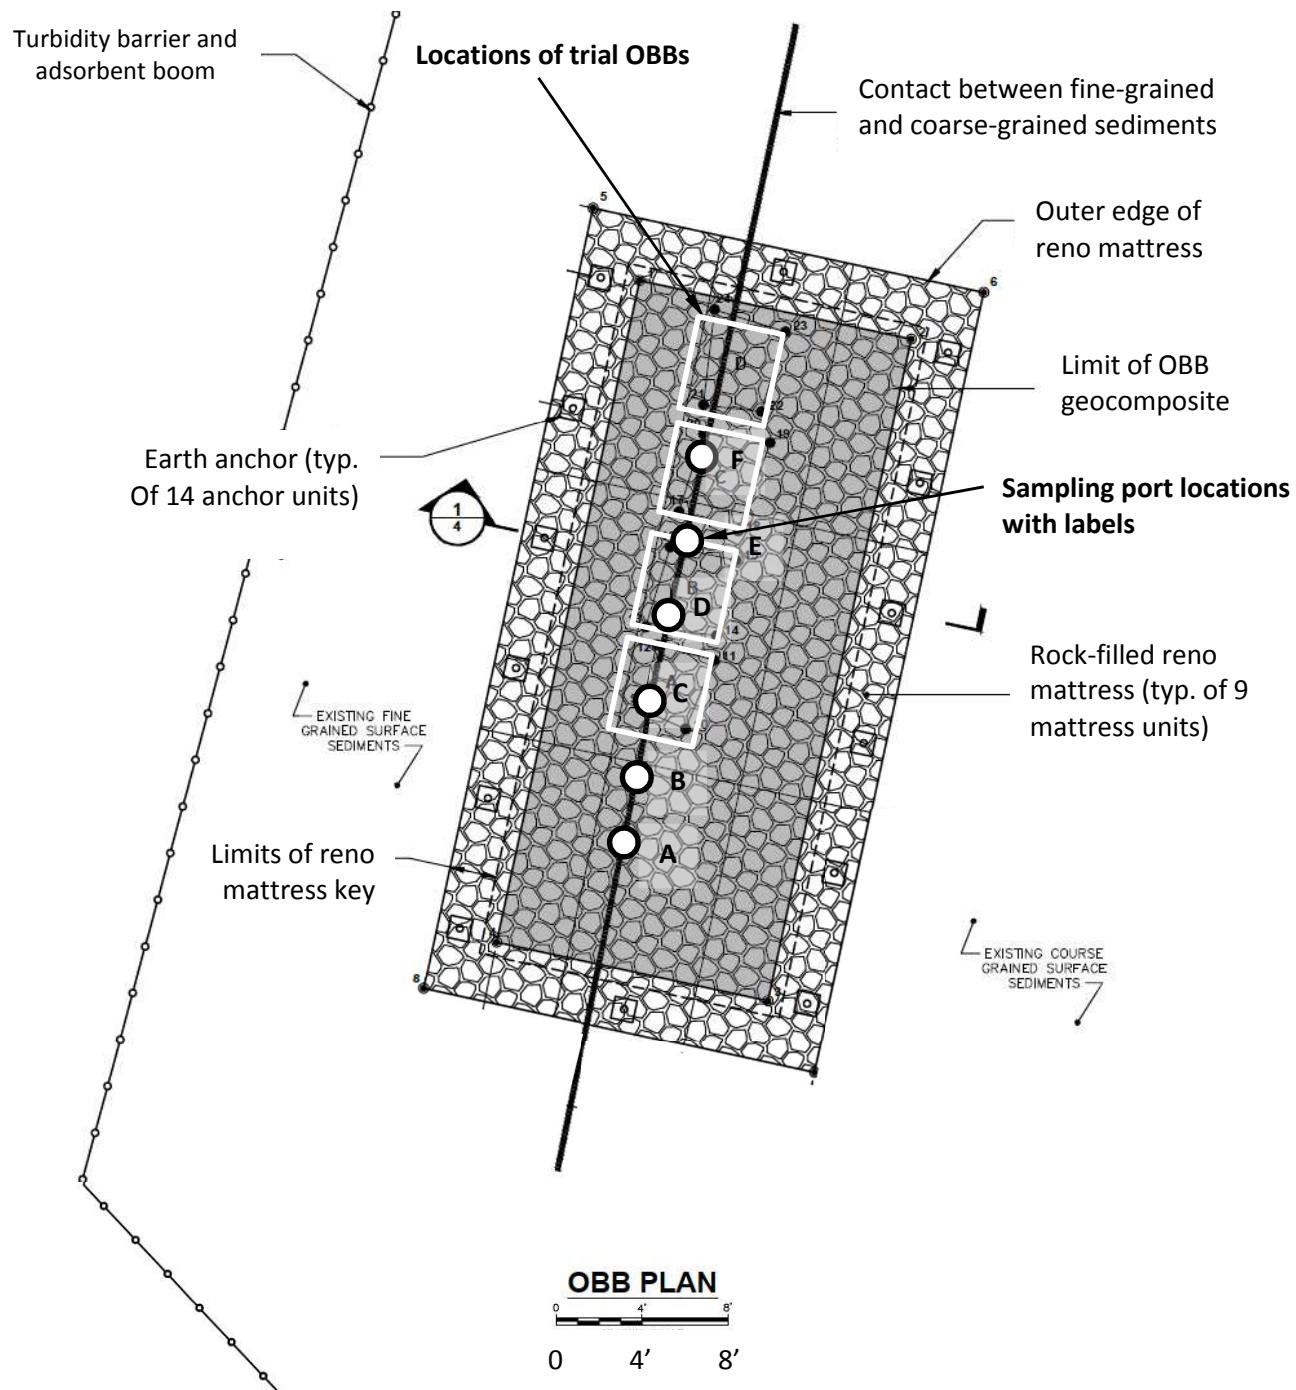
Full-scale OBB construction drawing (modified from ARCADIS)
